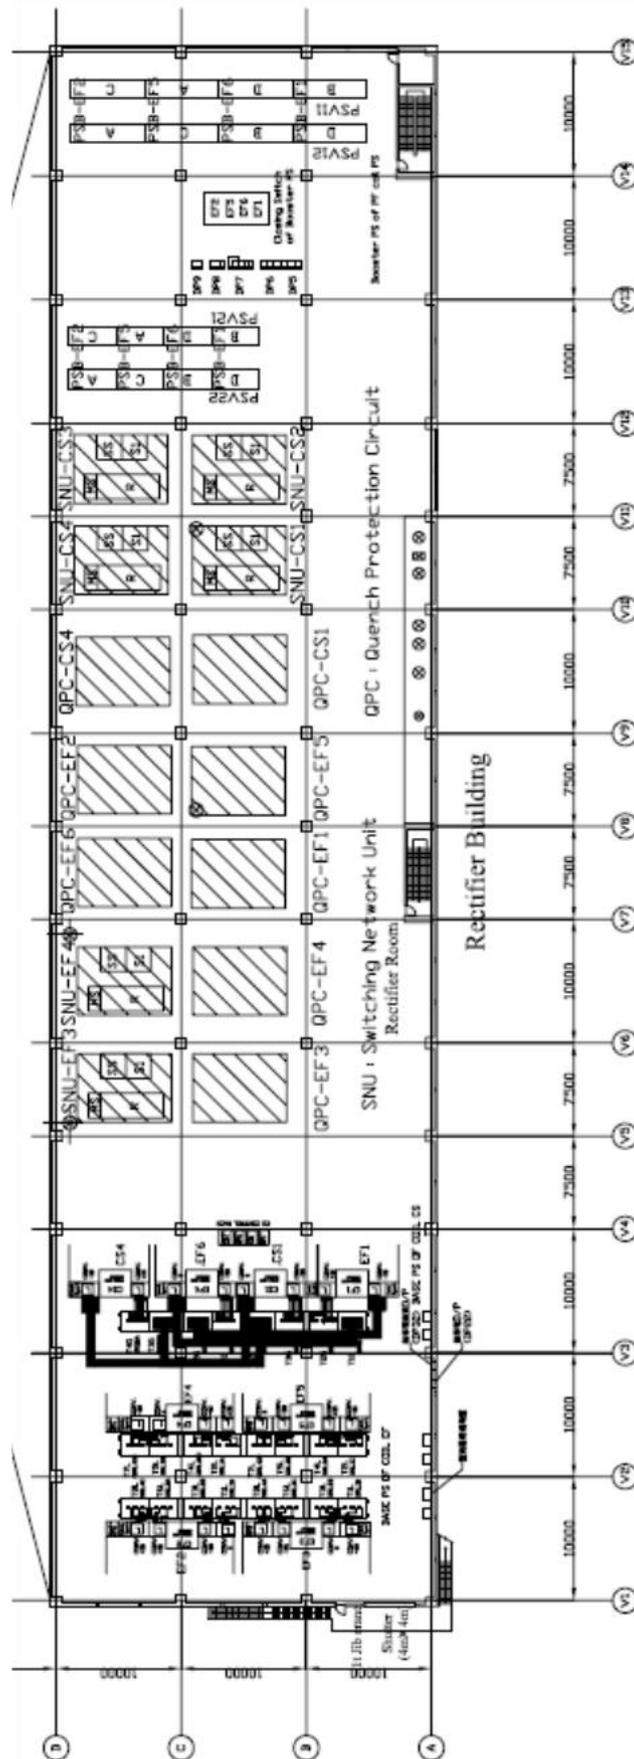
Layout of the devices in the second floor of the Rectifier Building.
